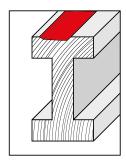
Drawing of cavity in the material on a horizontal surface of girder shelf.
